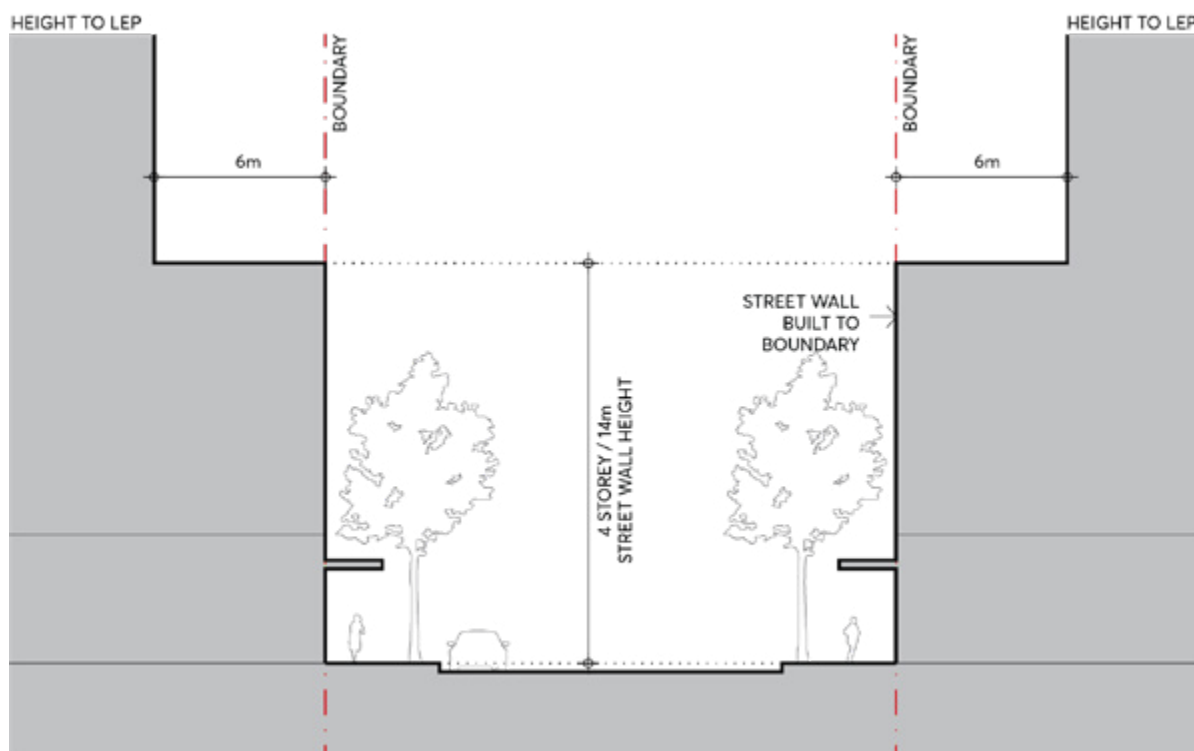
Park Edge Highly Sensitive Area Street Wall Height and Setbacks
